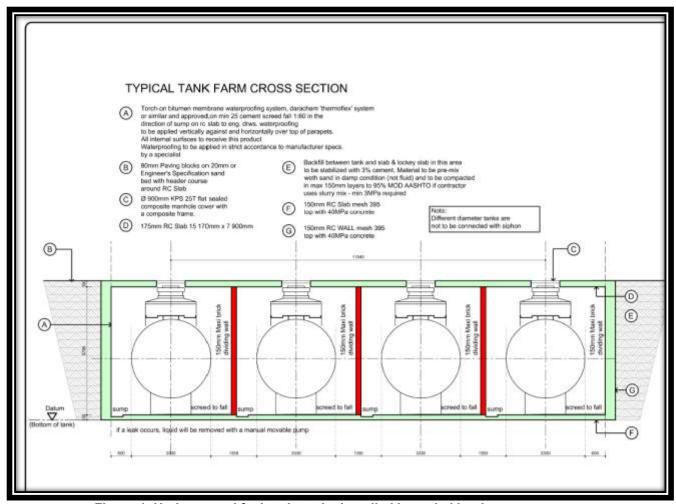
Underground fuel tanks to be installed in sealed bunkers.
